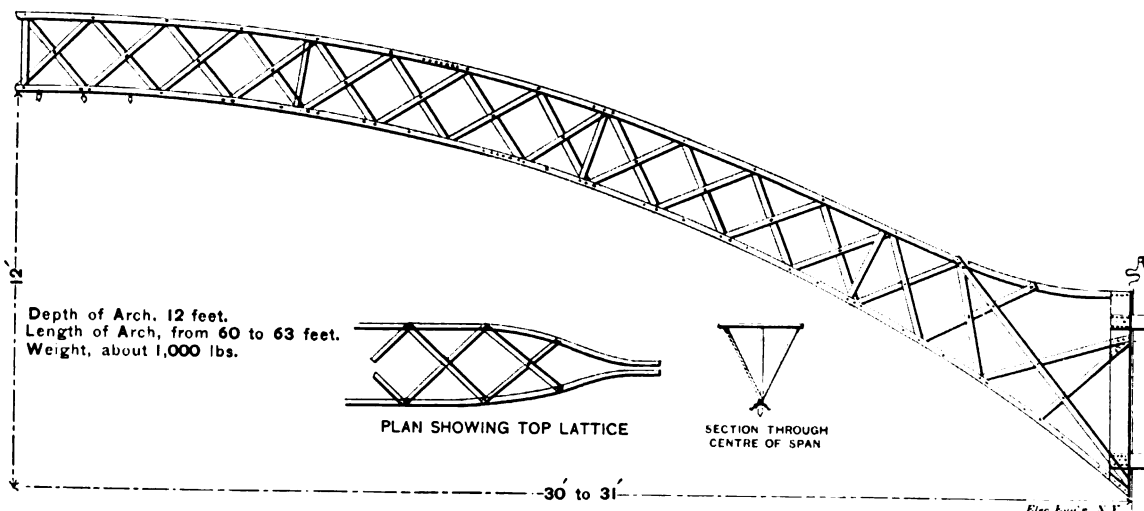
ELECTRIC LIGHT ARCH, COLUMBUS, O.—SIDE VIEW, PLAN AND SECTION.—(SEE PAGE 451.)
